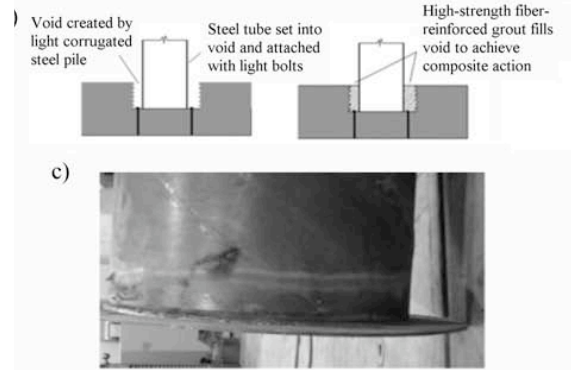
Proposed isolated CFT pier or column foundation connections with close-up of annular ring
